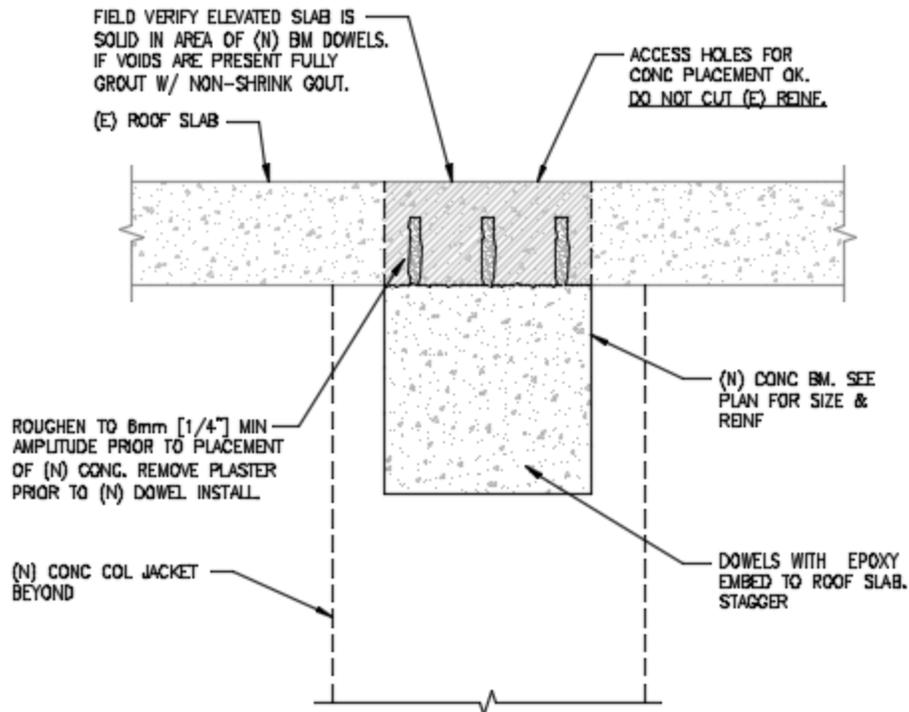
Add connection of concrete beam/shearwall with existing slabs and beams
